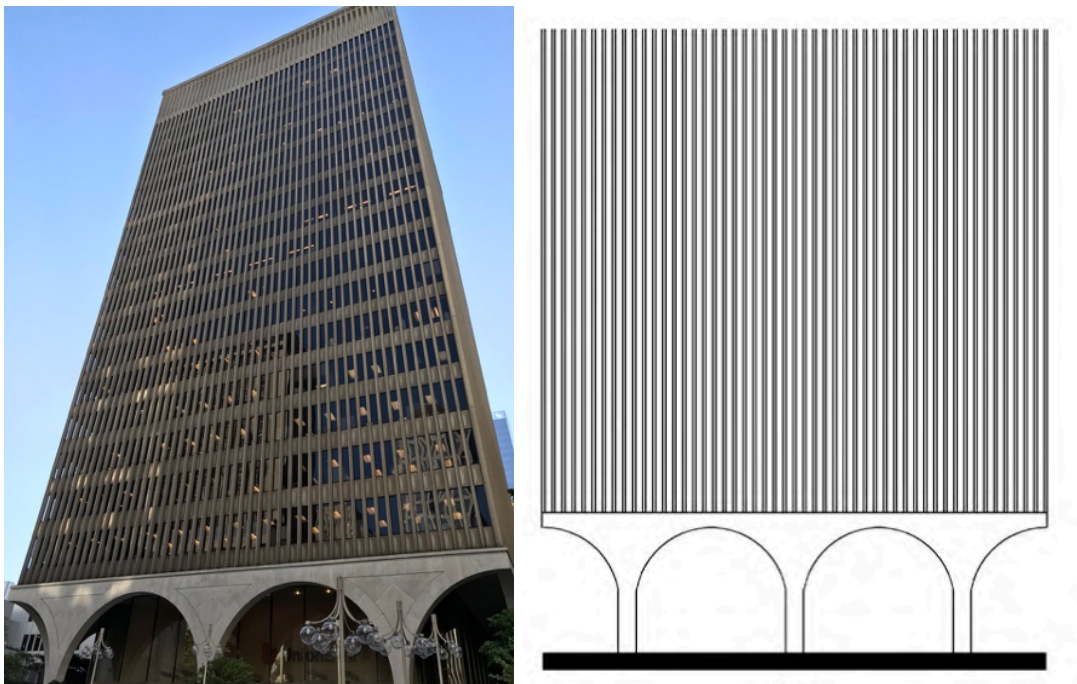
IBM Building, Seattle (on the left); detail of the transfer structure (on the right)
